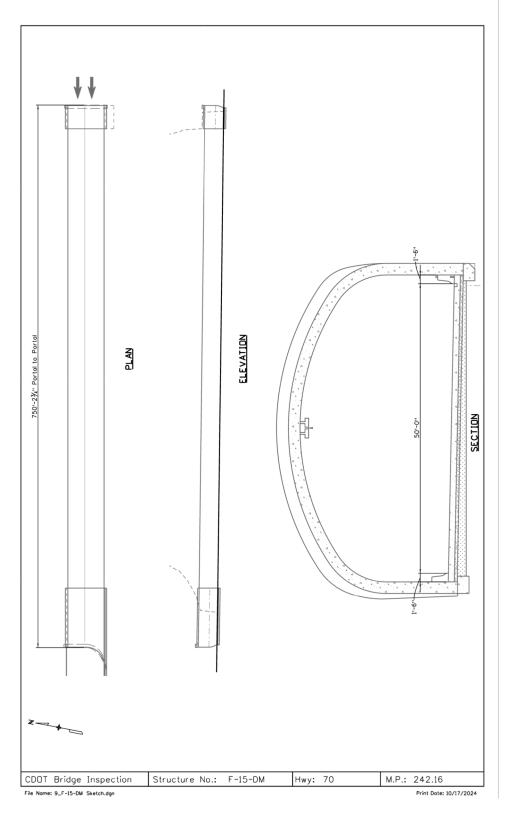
Tunnel Inspection Sketch – Example 9
